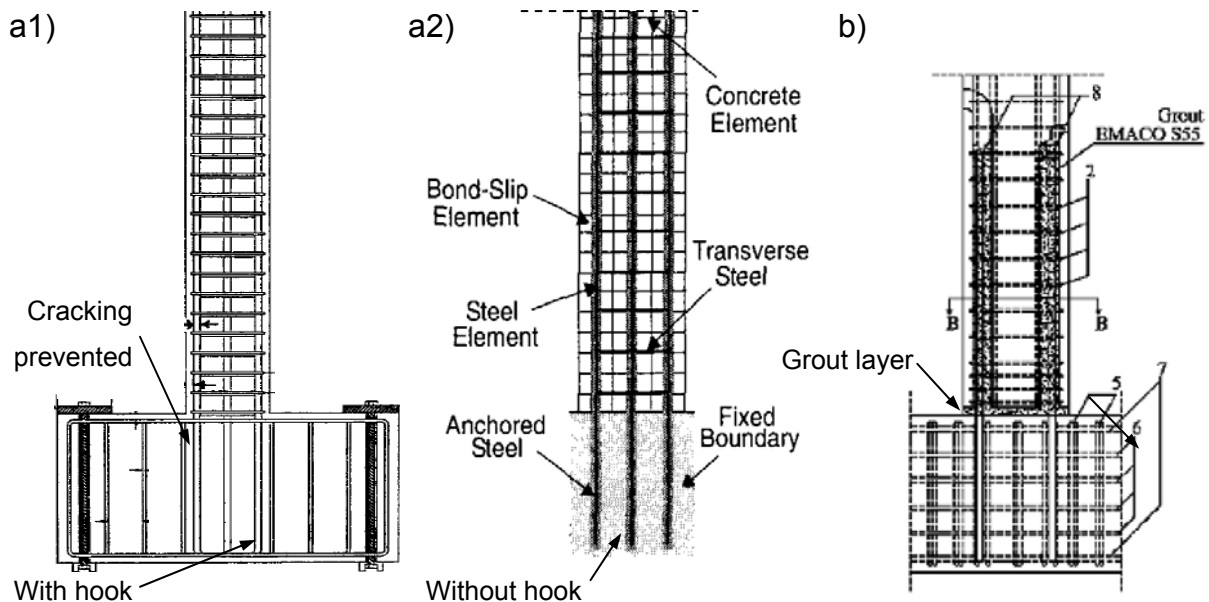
Examples for studies on column-to-foundation connections subjected to cyclic loading: a) Cast-in-place (*Bousias, S.; Verzeletti, G. et al. (1995)* and *Lee, J.-H. (2008)*); b) Post-installed (*Riva, P. (2006)*)
